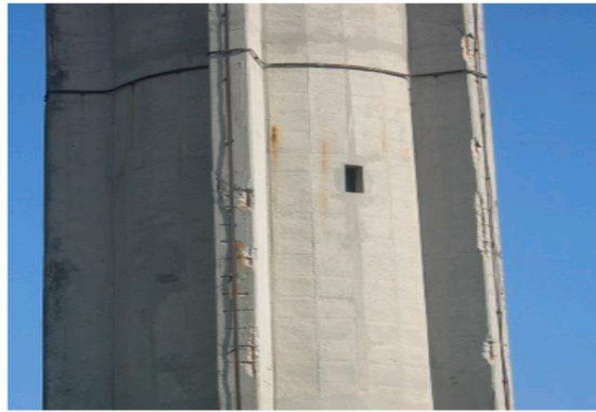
Cover detachment in the shaft ribs.[Dilena et al., 2021]
